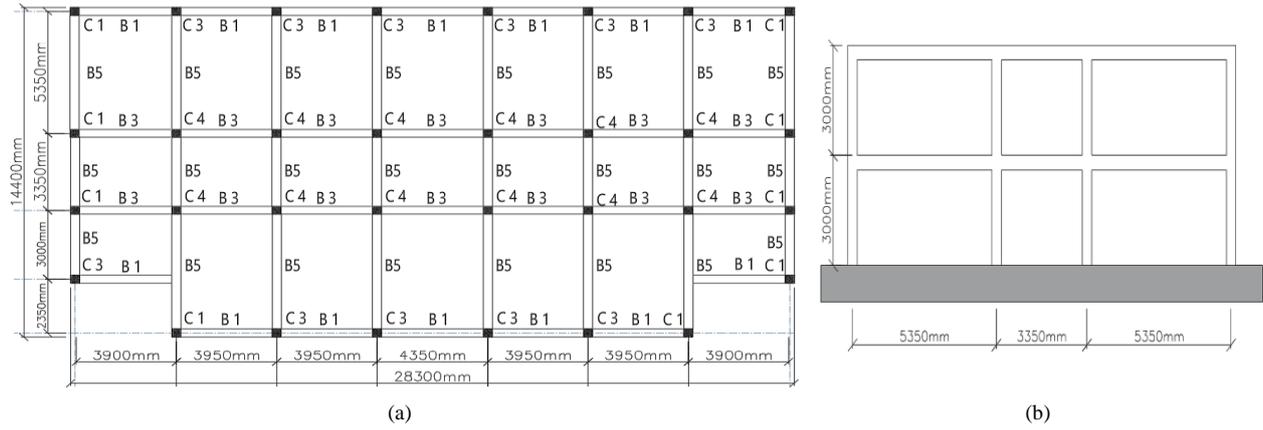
From Sharafi and Saito [15] B-type two-story RC structure (a) first-floor plan, (b) RC frame (transverse direction)
